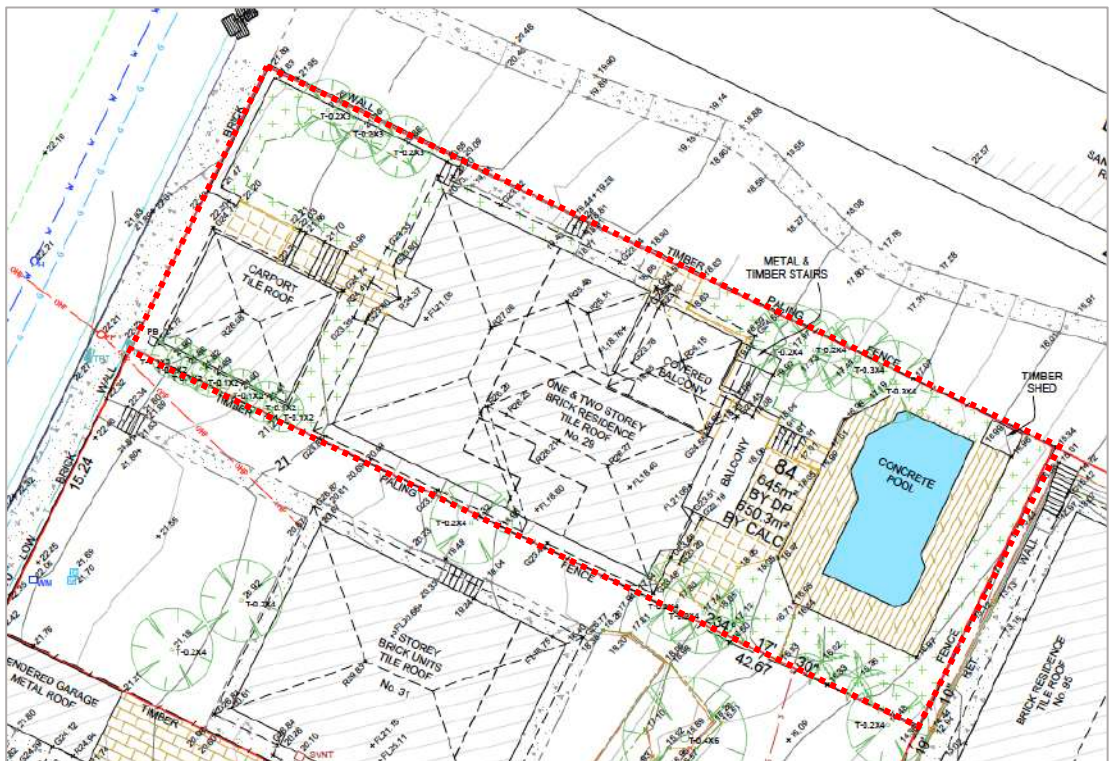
Survey No. 29 Reddall Street, Manly, Site outlined in red.
